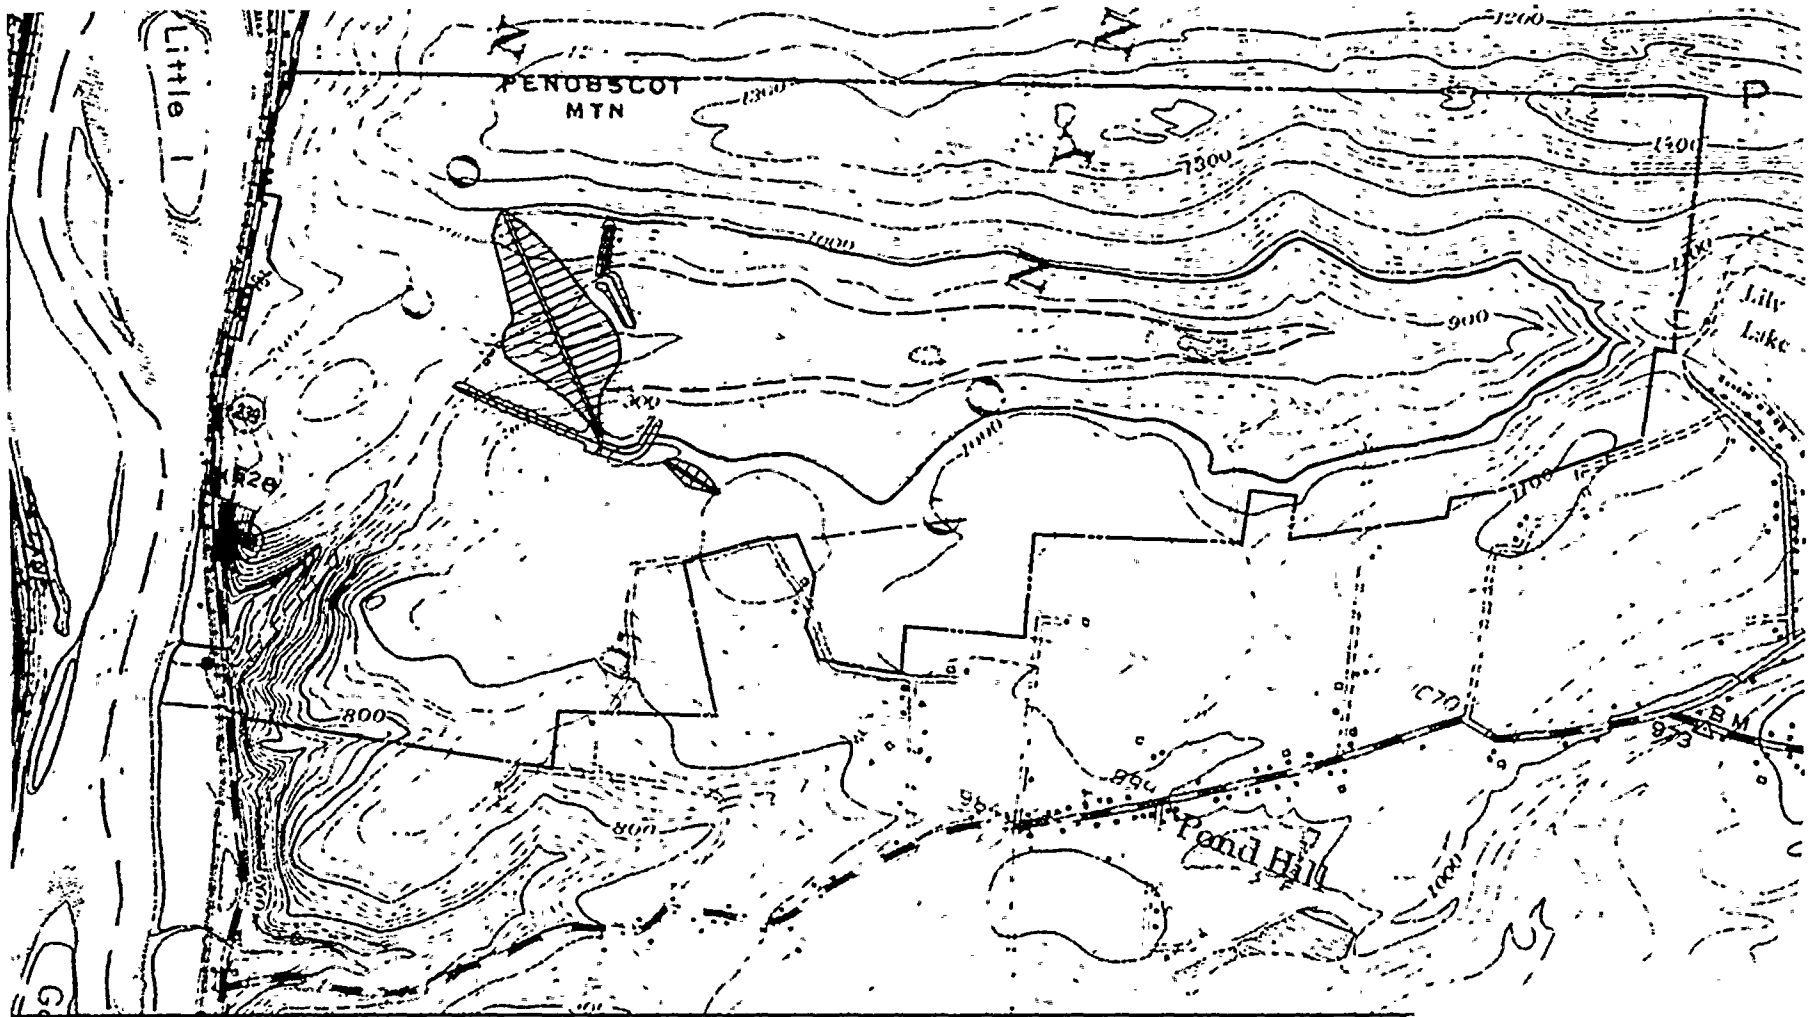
General Plan of the Pond Hill Reservoir Project
